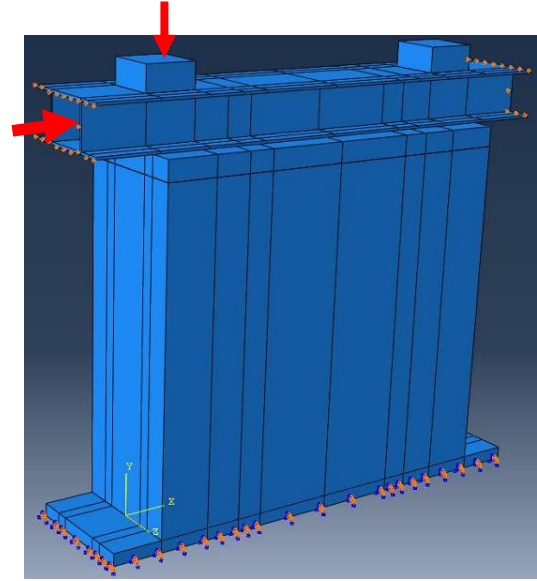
Numerical simulation of the loading arrangement for wall specimen S1M1.
